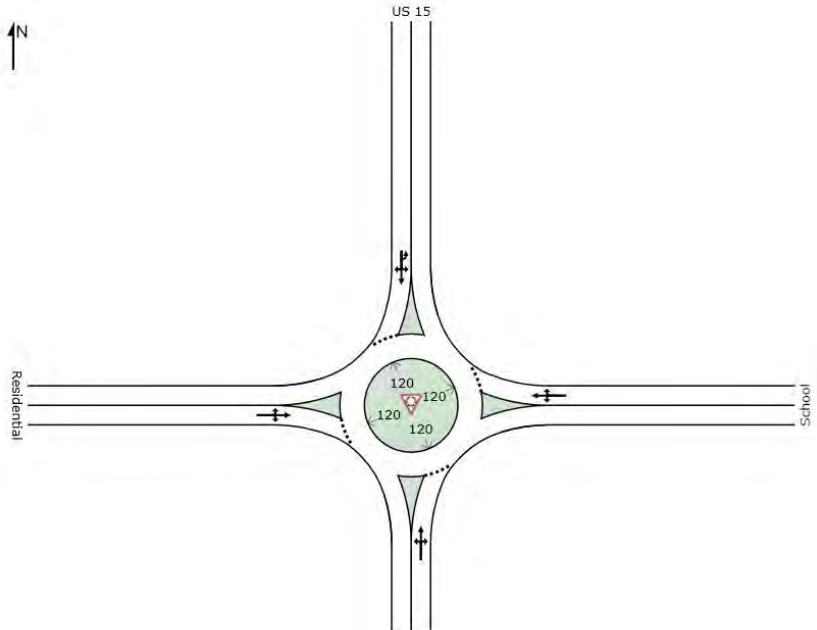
Geometric Configuration for the Roundabout at Lucketts Elementary Driveway
